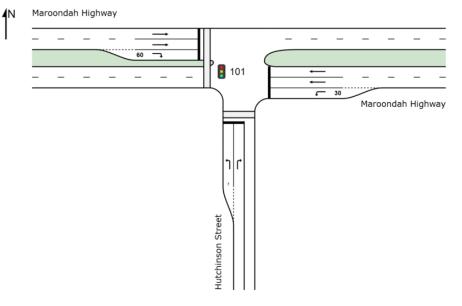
Maroondah Hwy / Hutchinson St Intersection Layout - Post Development Revised Layout
